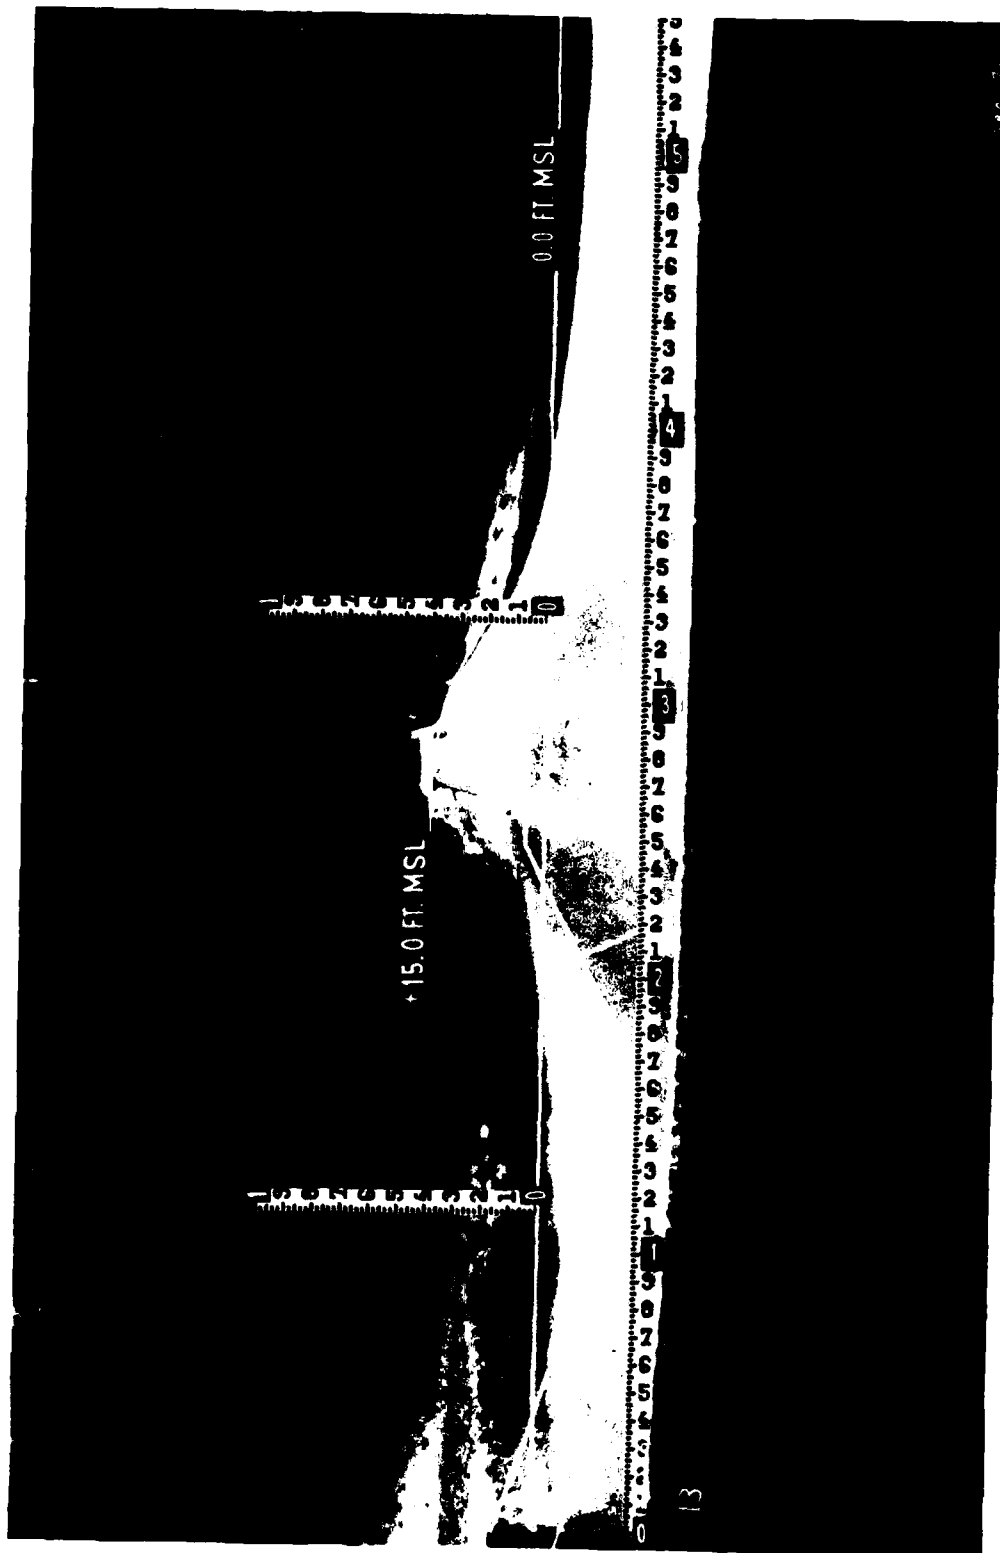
Side view of Plan N-3-A with trestle on north slope, 8.5-sec,
